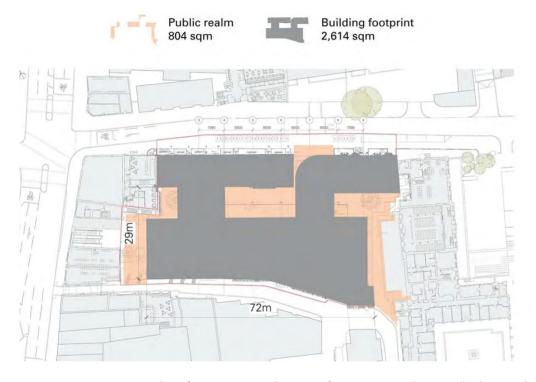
Diagrammatic plan of existing site with areas, of empty site, and existing built space (grey)
